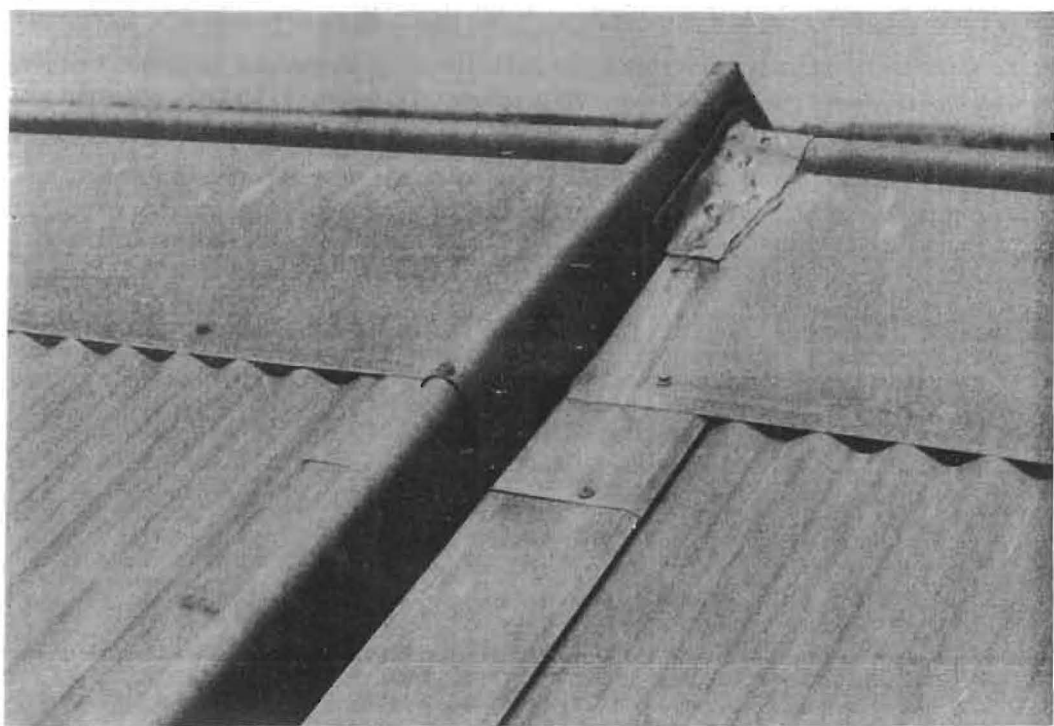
An expansion joint, at the place where it joins the roof ridge.
